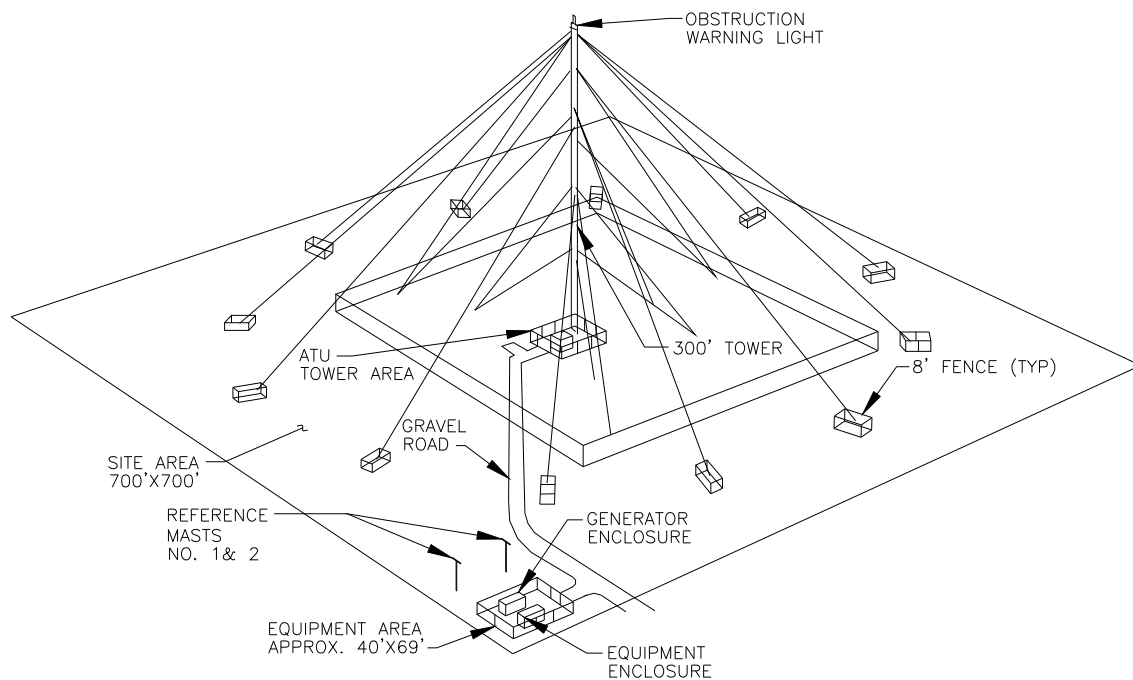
TYPICAL LAYOUT OF A GWEN SITE.
